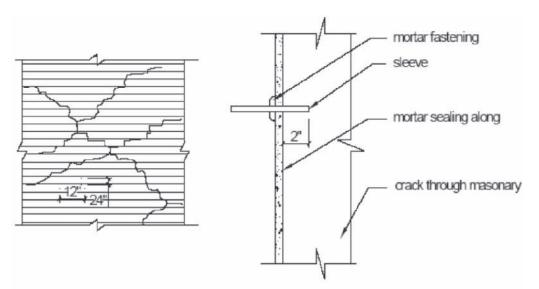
Injection repair of cracks in masonry wall
